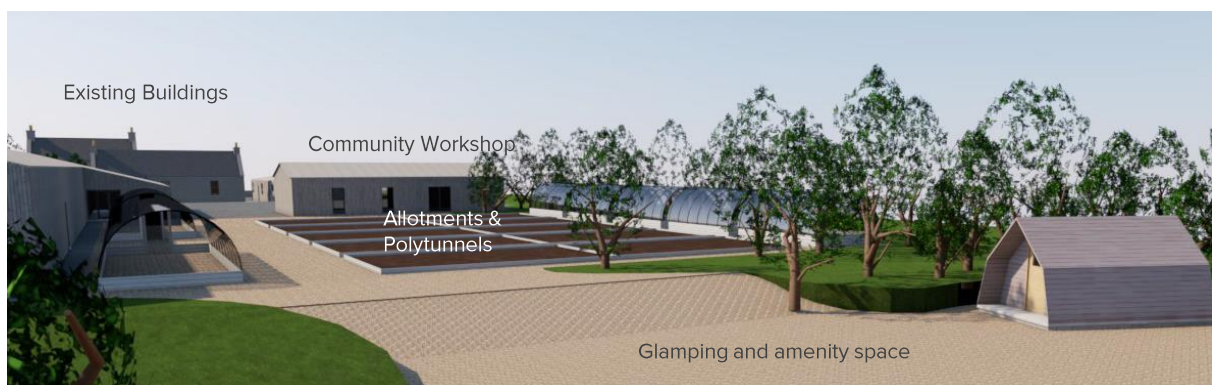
Option 1, view from amenity space overlooking allotments and workshop with existing buildings in the background
